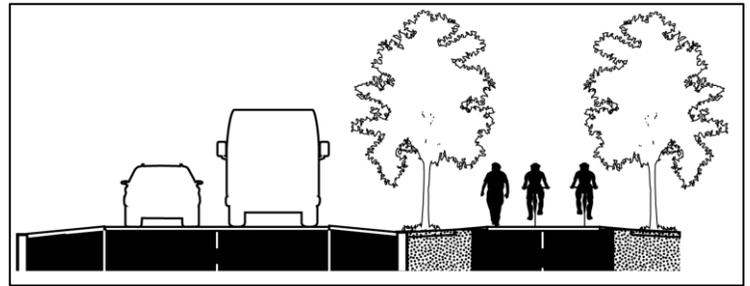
Off-Street Pathway Cross Section (Source: TAC, 2017)
